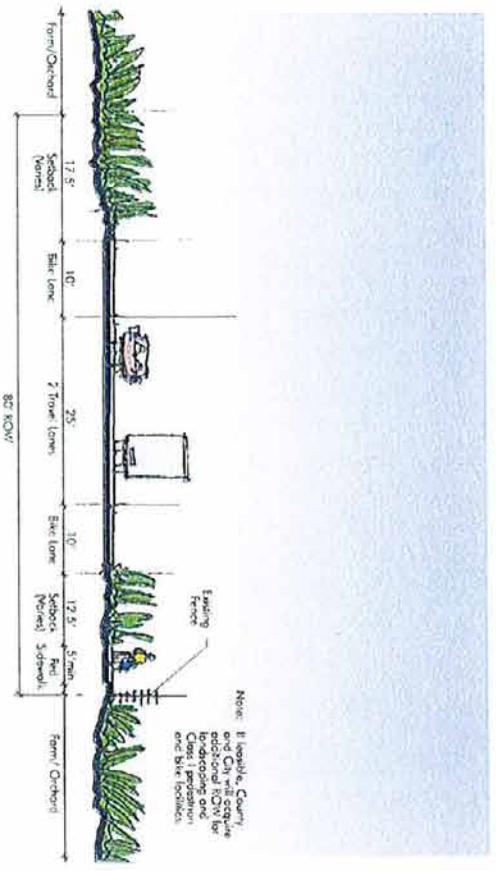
CROSS SECTION OF COMPLETE STREETS CONCEPT (COUNTY ROAD)
